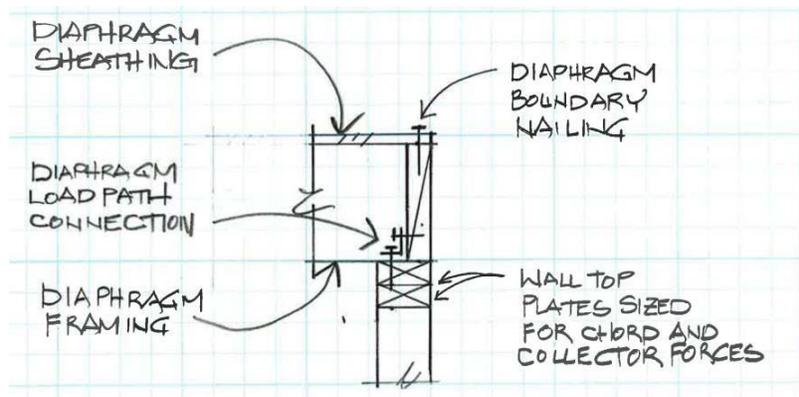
Diaphragm edge detail showing wall top plates serving as chord and collector
